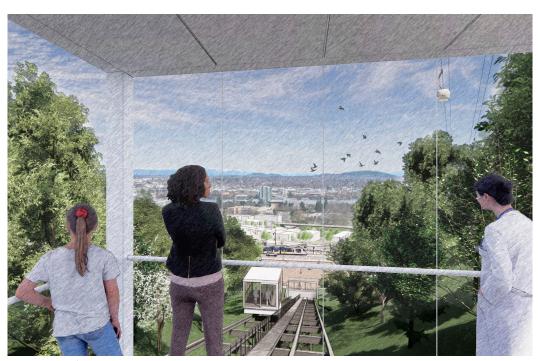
View from inside the inclined elevator, looking east toward Gibbs Street Station and the plaza below.
